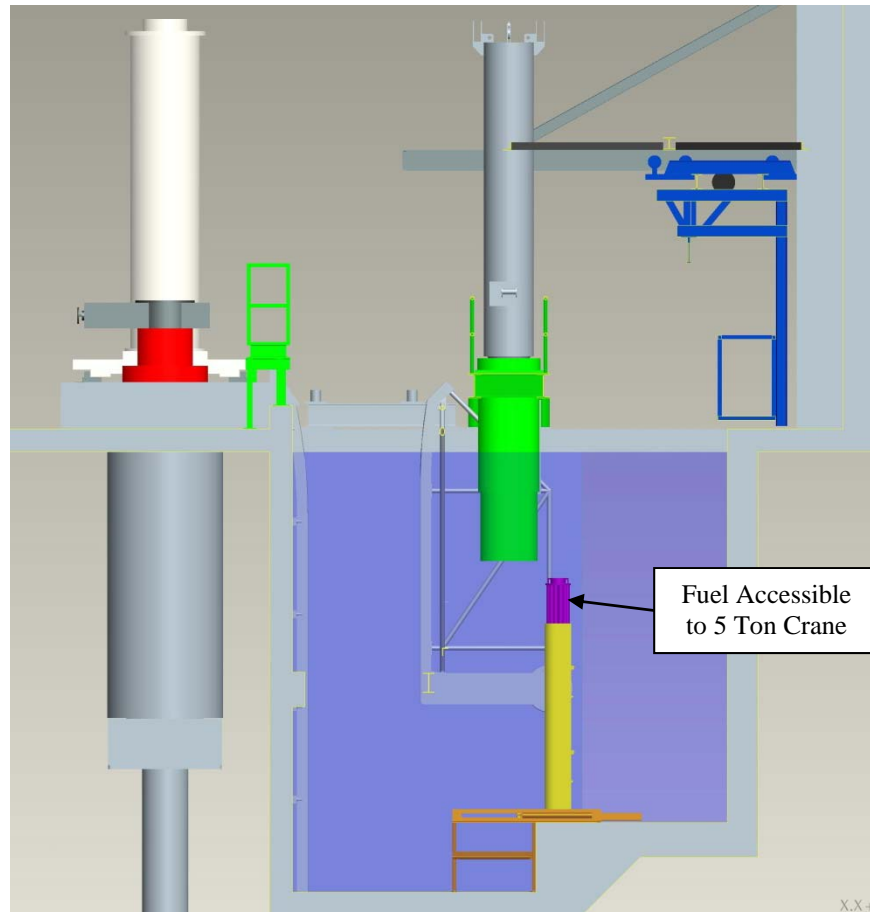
L-Basin Disassembly Area After Fuel is Made Accessible to 5 Ton Crane
